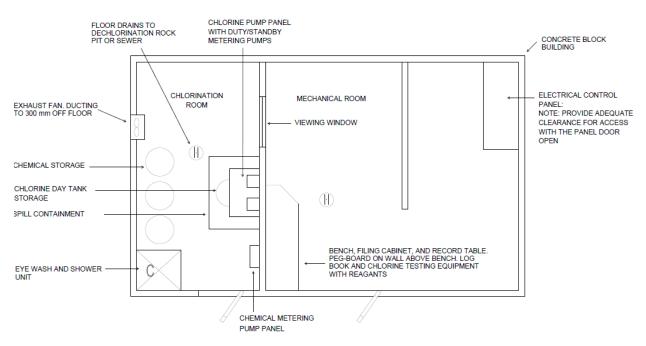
Example well pump, chlorine and control building layout, showing details for chlorination room (sourced from Design Guidelines for First Nations Water Works, ISC, 2006)
